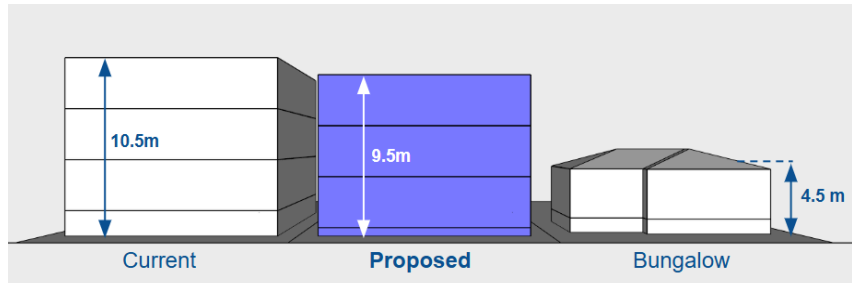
Front View - Pitch Roof Maximum Height 9.5 m
